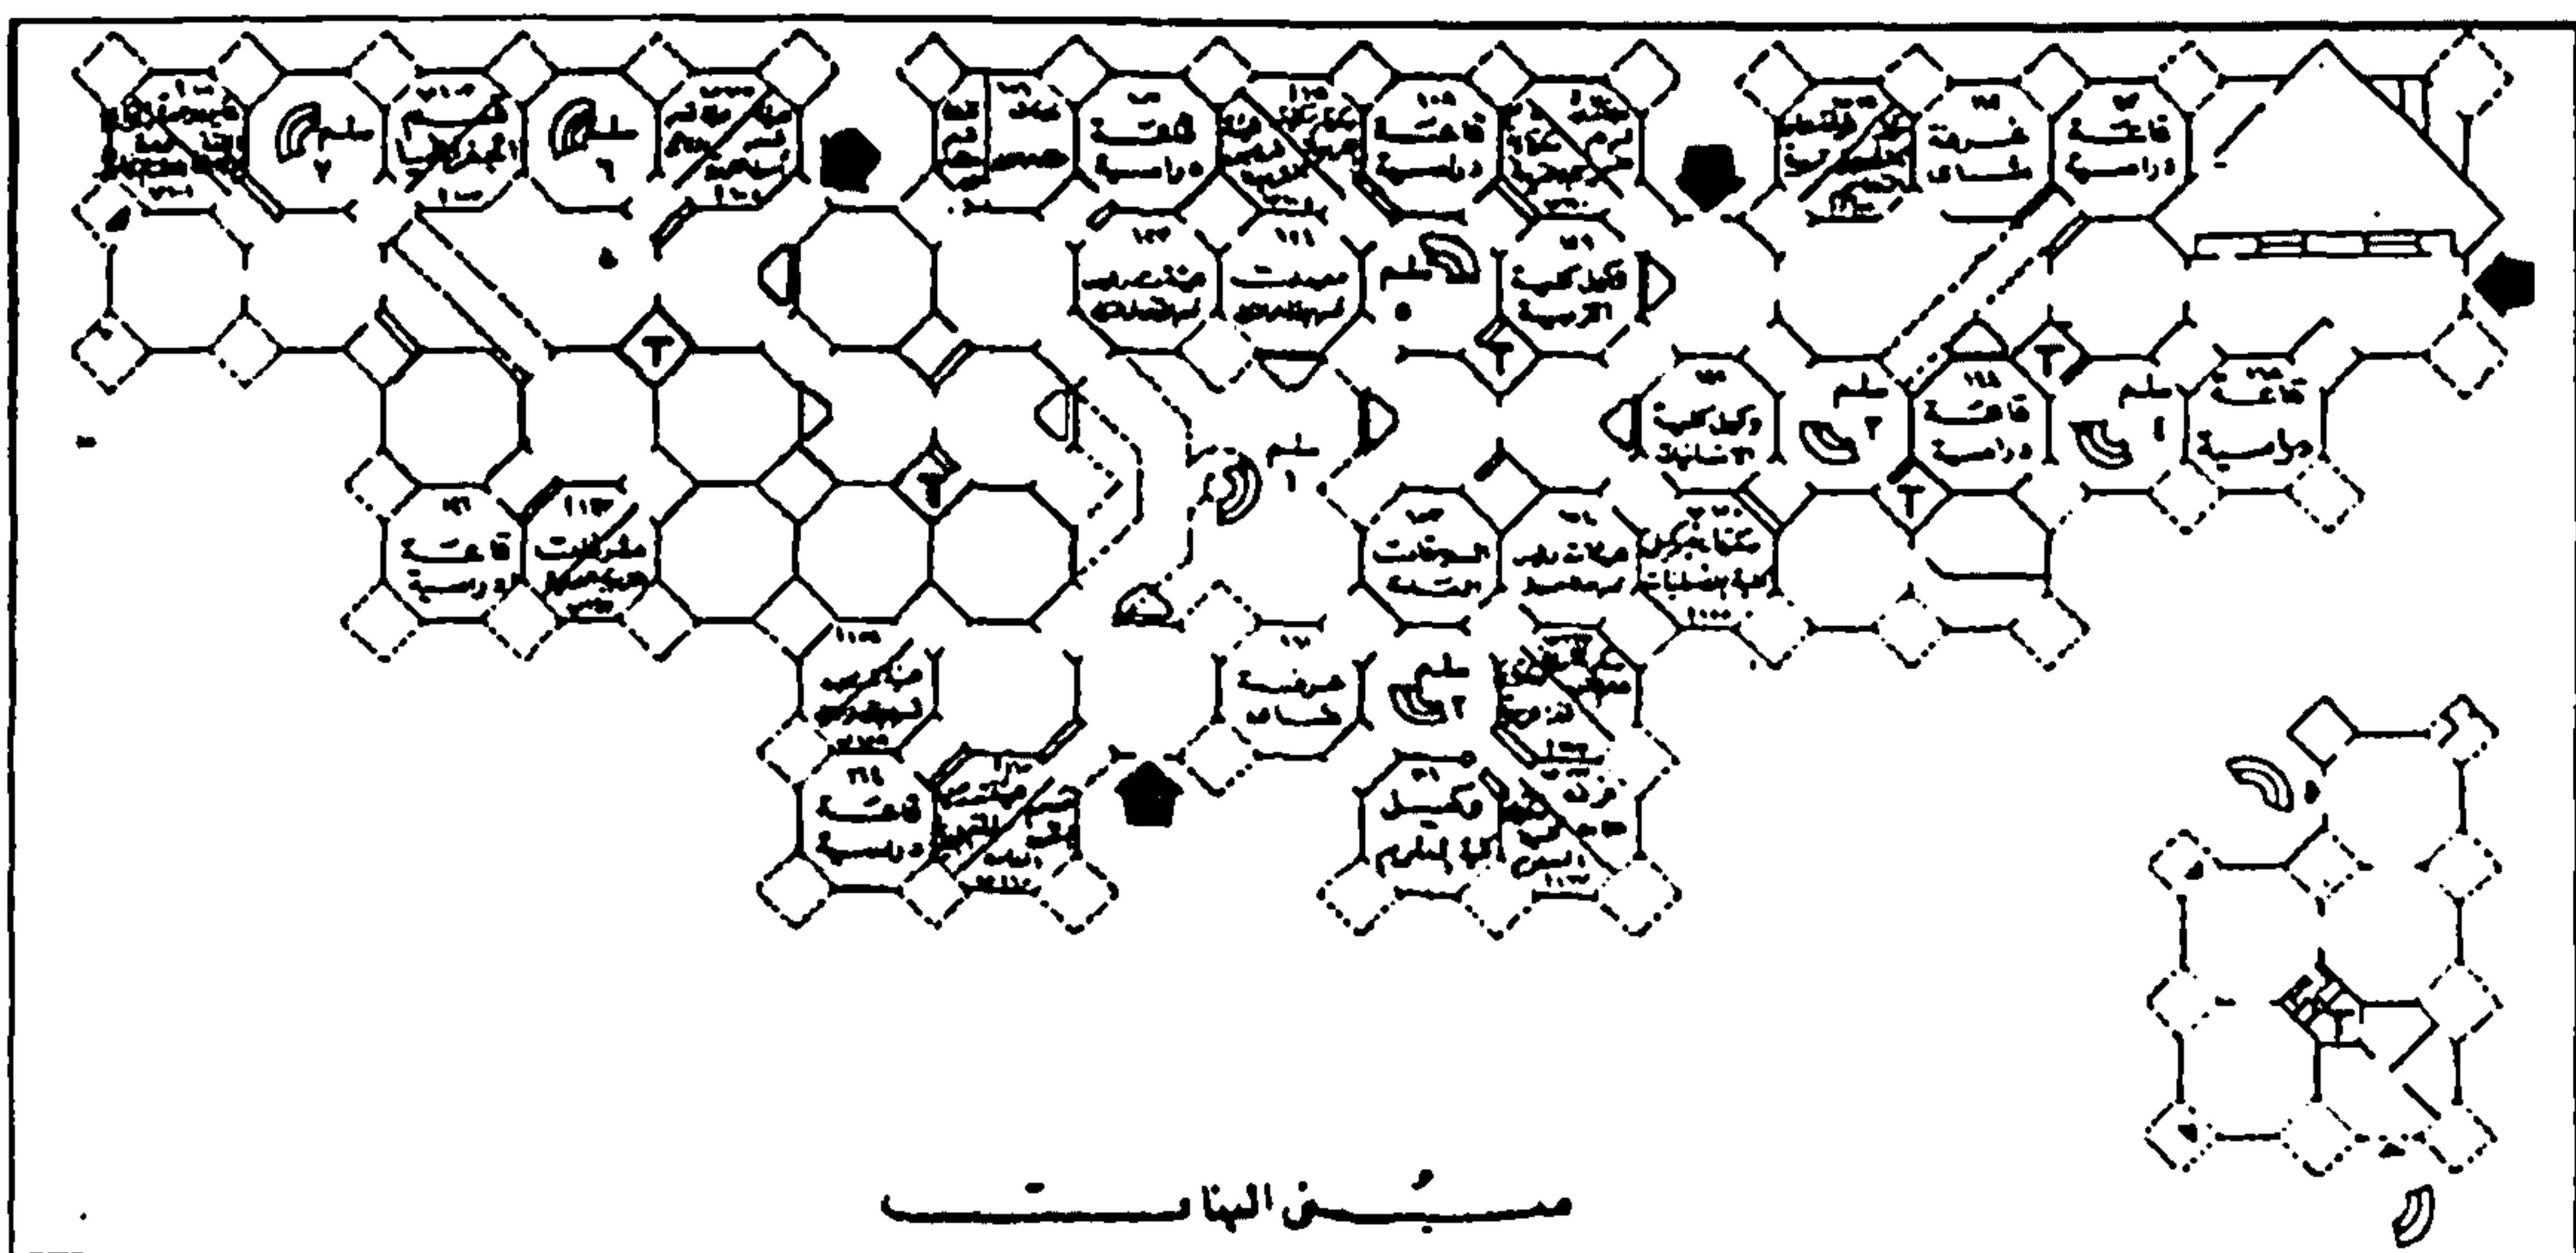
The layout of rooms in the Women's Building at Qatar University.
